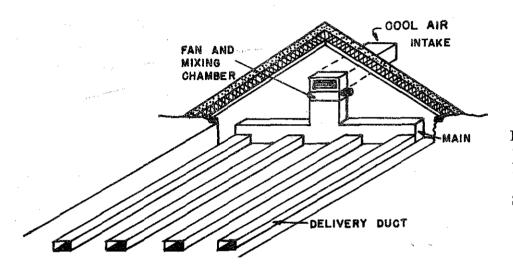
Typical Ventilation System 40' wide Potato Storage.
